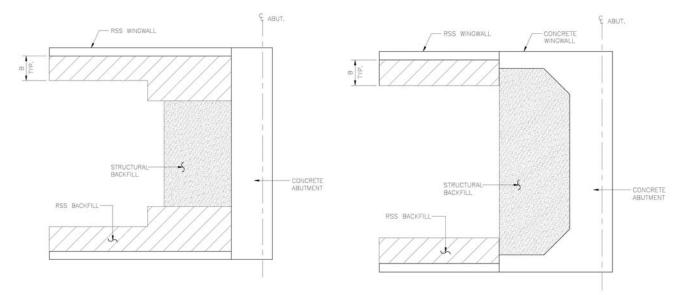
Backfill for Concrete Abutment with RSS Wingwalls (B=0.8H).
